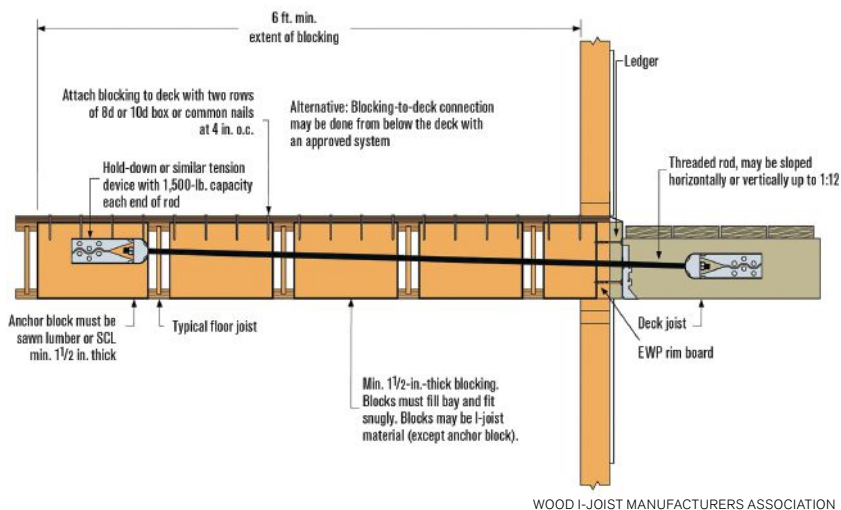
When there is an I-joist floor system running perpendicular to the deck joists, install solid wood blocking between several inboard joists to a point at least 6 feet back into the floor system before mounting hardware.
